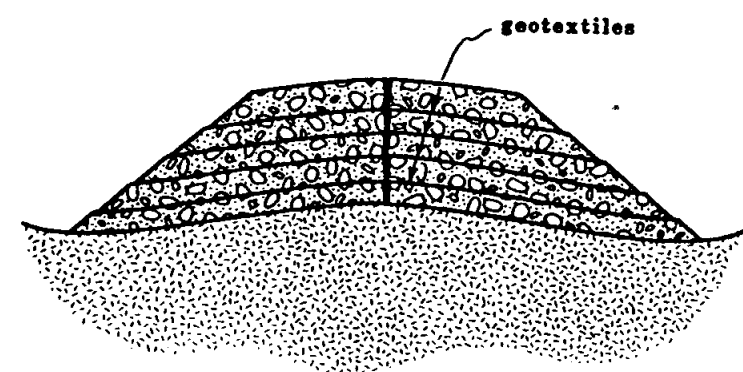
Geotextile-induced shear failures minimizing crack width
